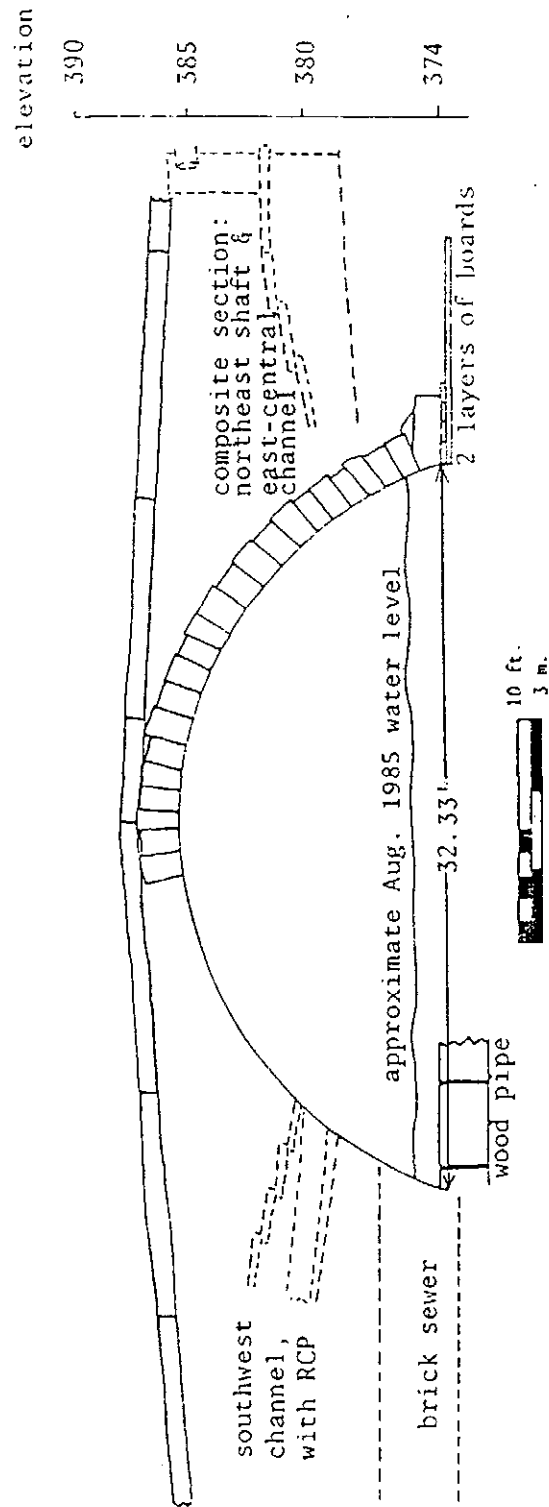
SCHEMATIC SOUTH ELEVATION, WITH SUBSURFACE FEATURES
